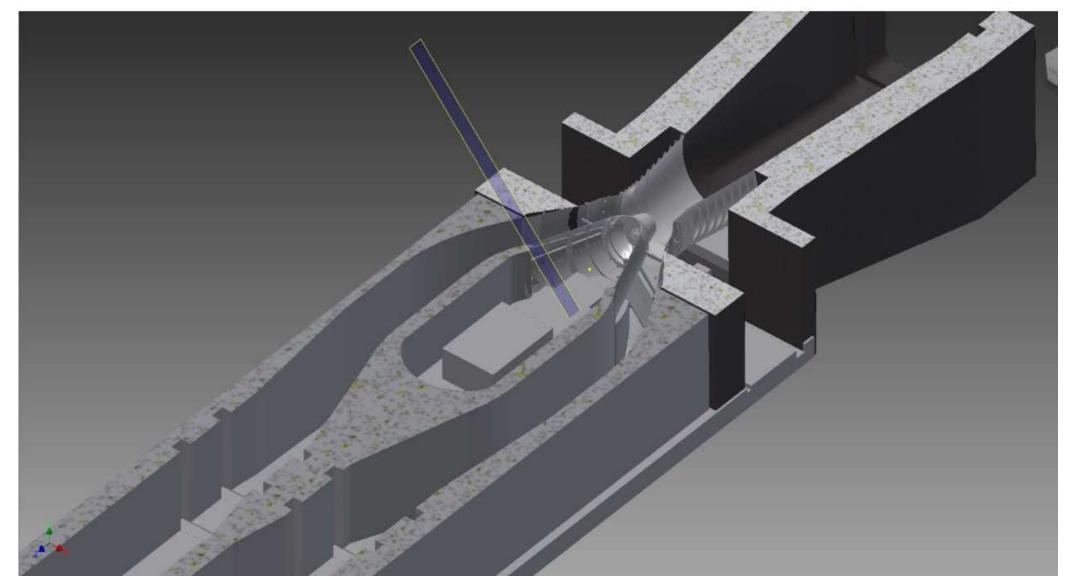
Pit Type HFK Front View at Runner Chamber End
